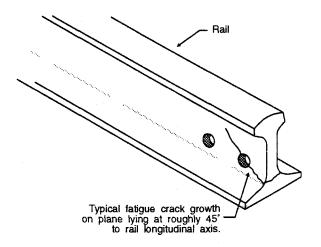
Typical Cracks Originating at Rail-End Bolt Hole
